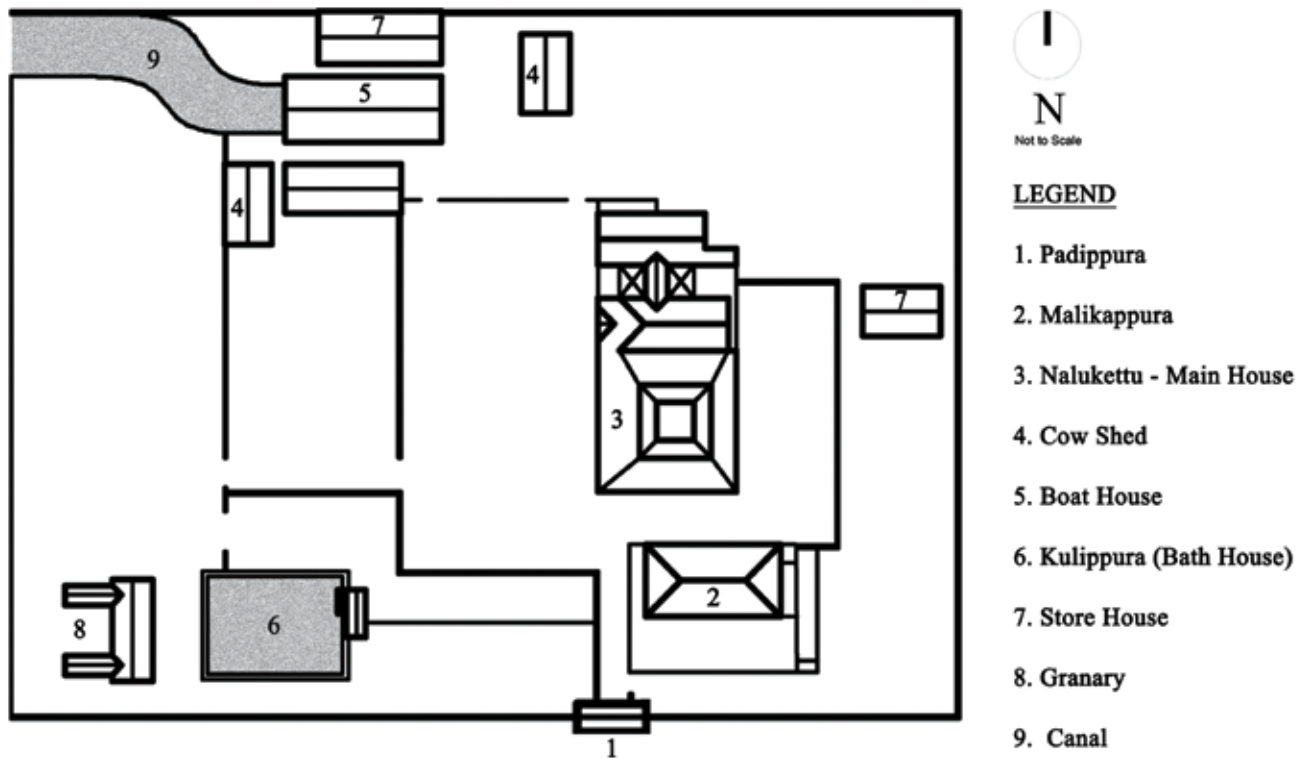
Typical Site Plan of Agricultural oriented *Nalukettu*, Source: Author.
